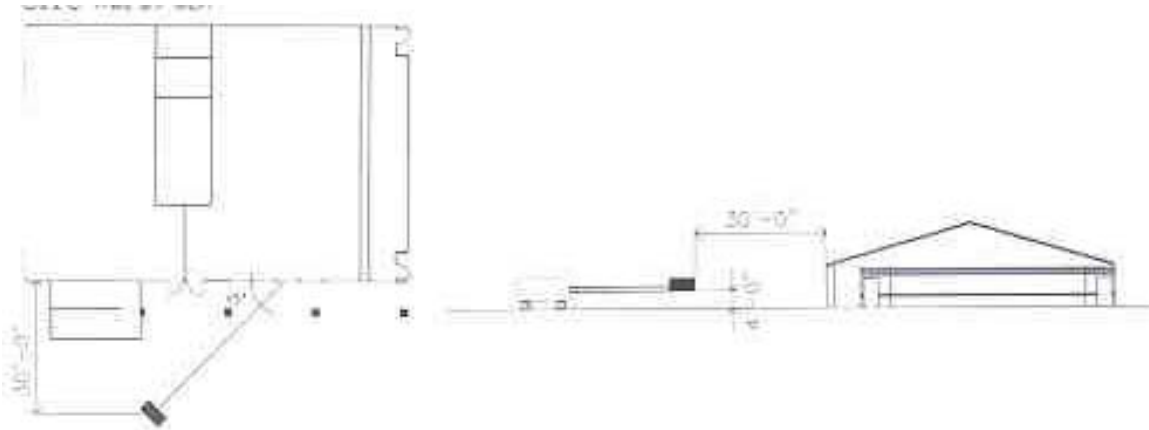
Sketch illustrating source location for wall/window/door assembly OITC tests.
